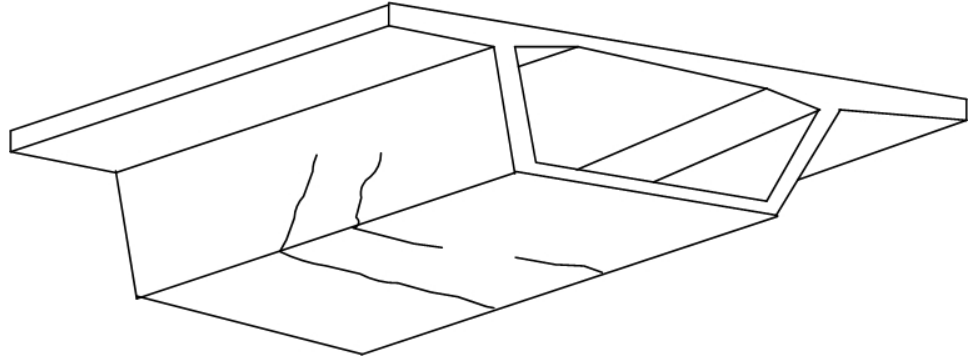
Box Girder Cracks Induced by Flexure-shear
